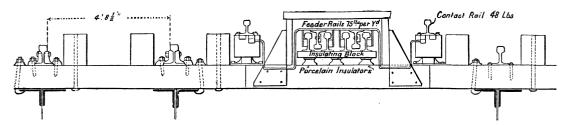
CROSS-SECTION OF ROADWAY, CHICAGO ELEVATED RAILWAY.
